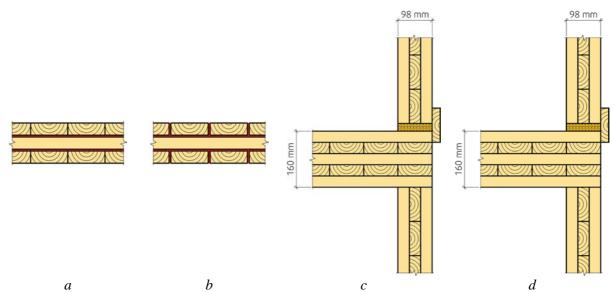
Details from the test sections. CLT without glue between the board edges (a), CLT with glue between the board edges (b), sylomer mat between the floor section and the wall section covered with a spruce board 21 mm x 98 mm (c), plywood blocks between the floor section and the wall section covered with a spruce board 21 mm x 98 mm (d).
